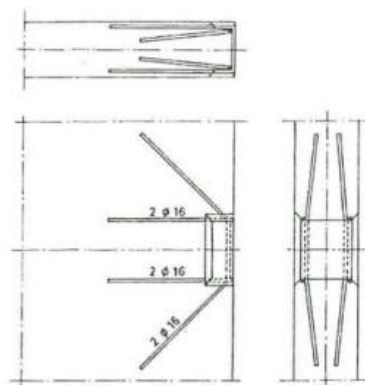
Welded steel profiles that are casted in the concrete [Falger 2004]
